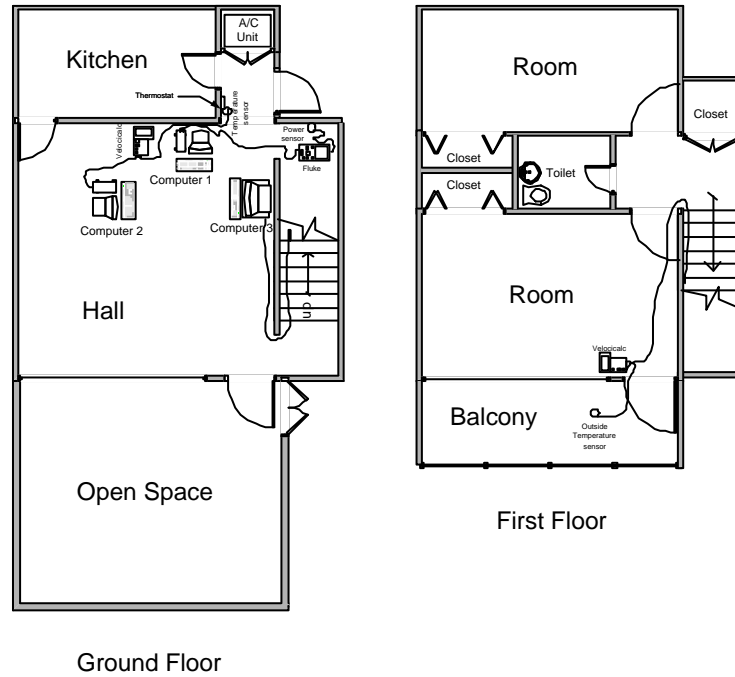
Instruments Setup Plan at Residential House, Rabee Courts, KFUPM.
